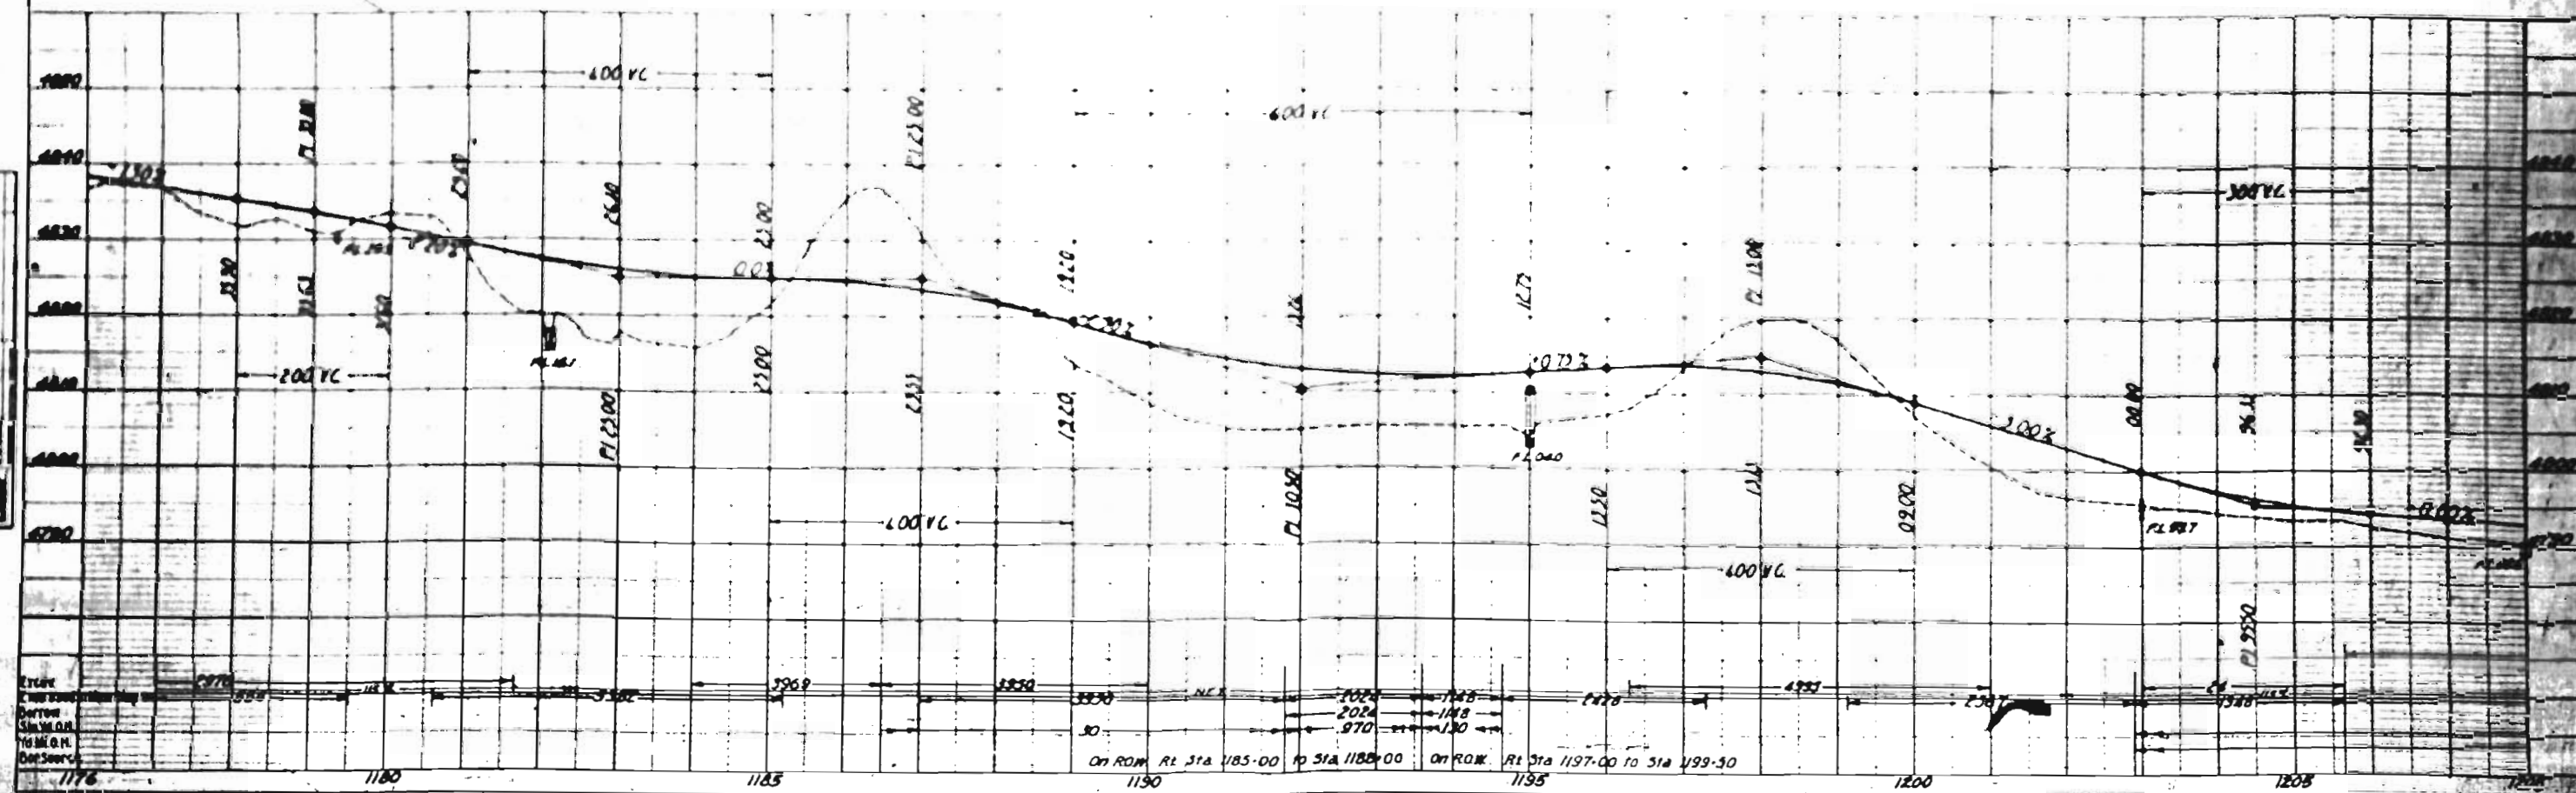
PLAN PROFILE 3" x 6" STANDARD
